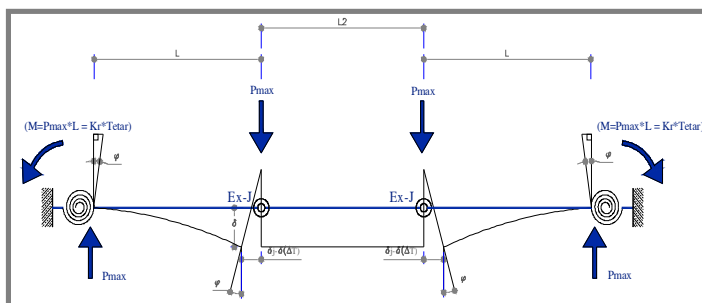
Model 2 Diagram: Fixed Bent supports, expansion abutments
